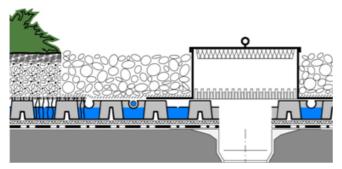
Outlet with Inspection Chamber KS 10 – layout of a strip of filter sheet (not a Wicking Mat!)
